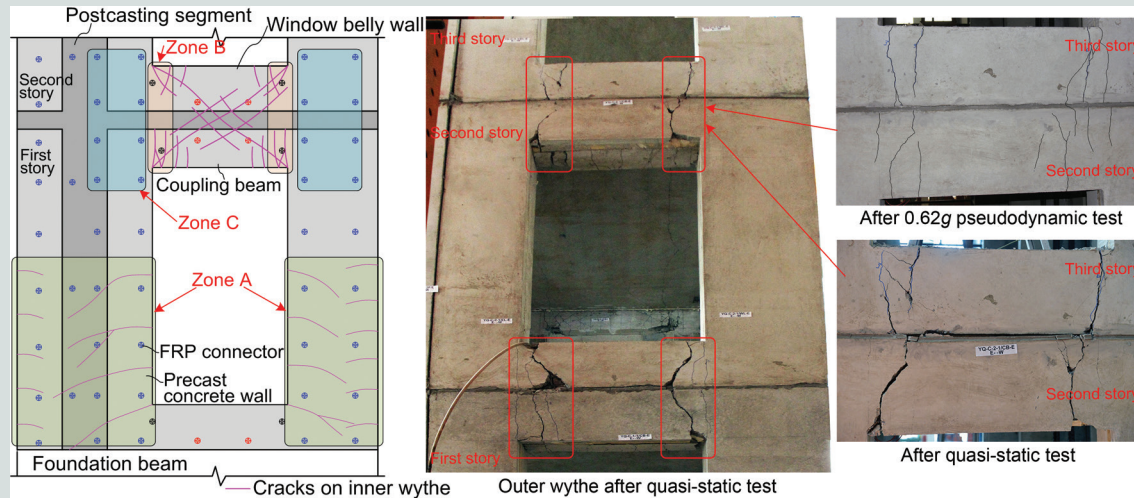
Failure mode of the outer wythe of precast concrete shear walls on axis C. Note: FRP = fiber-reinforced polymer; g = acceleration due to gravity.
